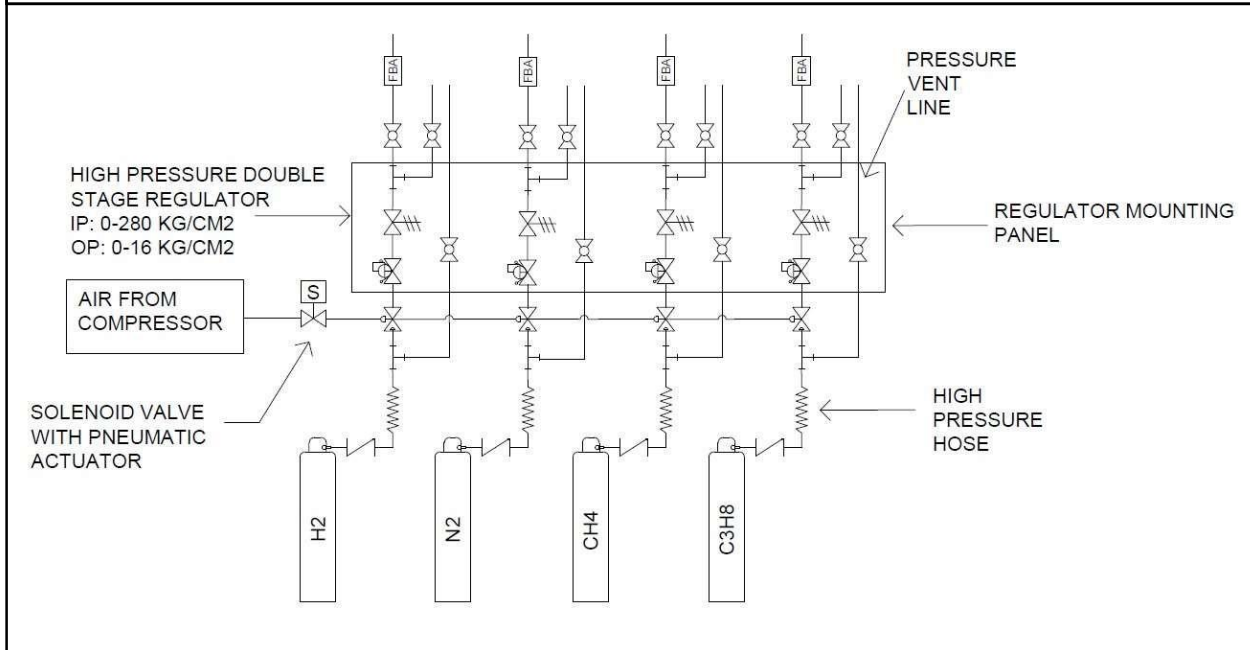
II - Pipeline from source to outlet (wall-mounted panel)
